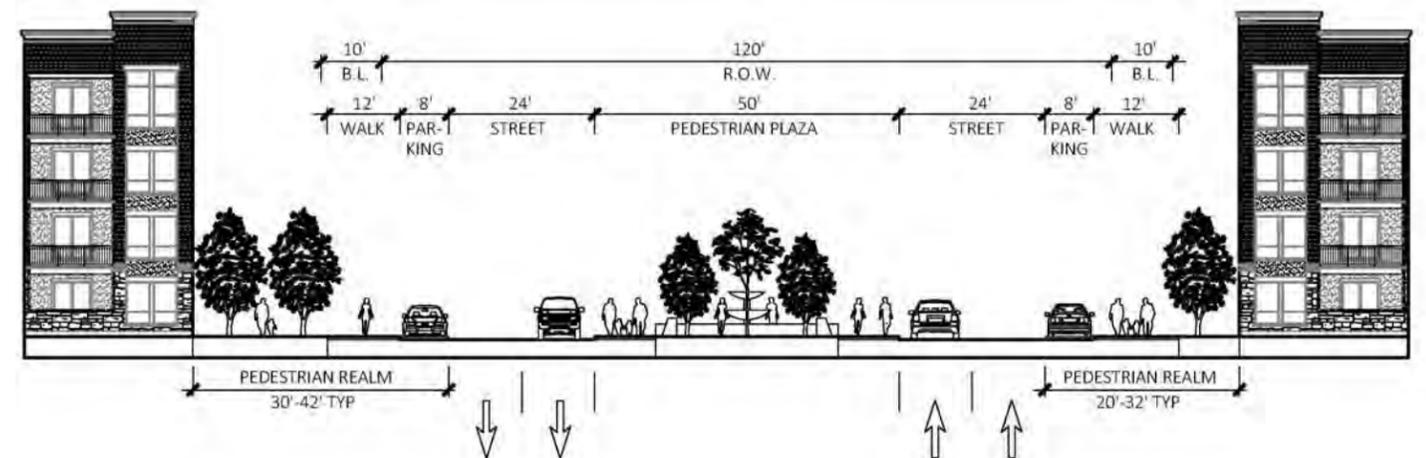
Type 'B' Street @ Pedestrian Plaza (with on street parking)
